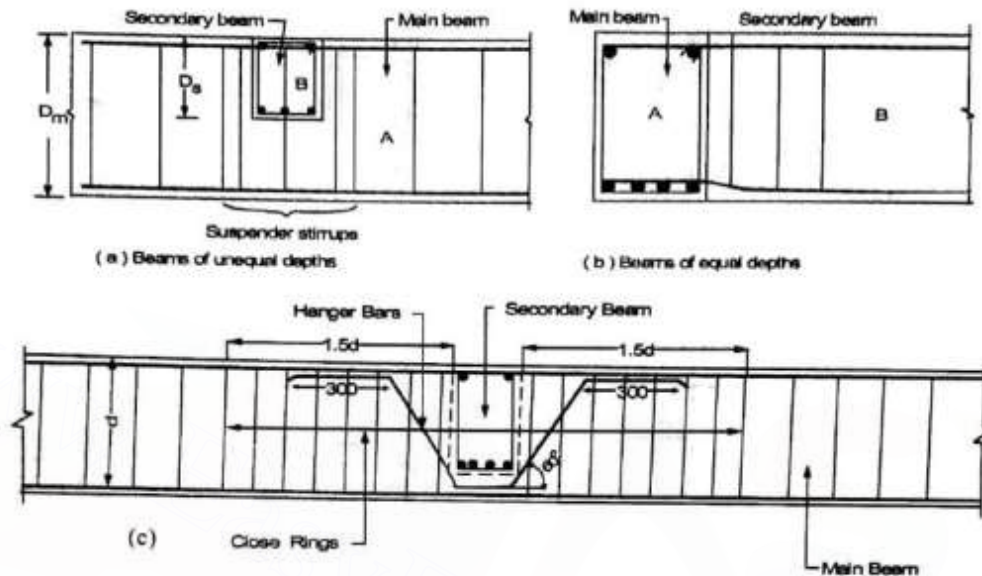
Main Beam Supporting Secondary Beam
